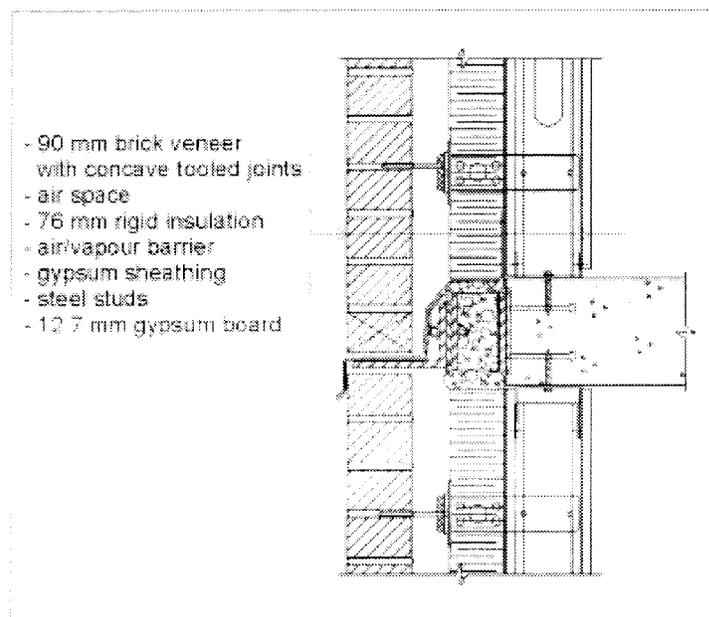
Contemporary BVSS Wall System (Source: Brick Veneer Steel Stud: Best Practice Guide, CMHC)
